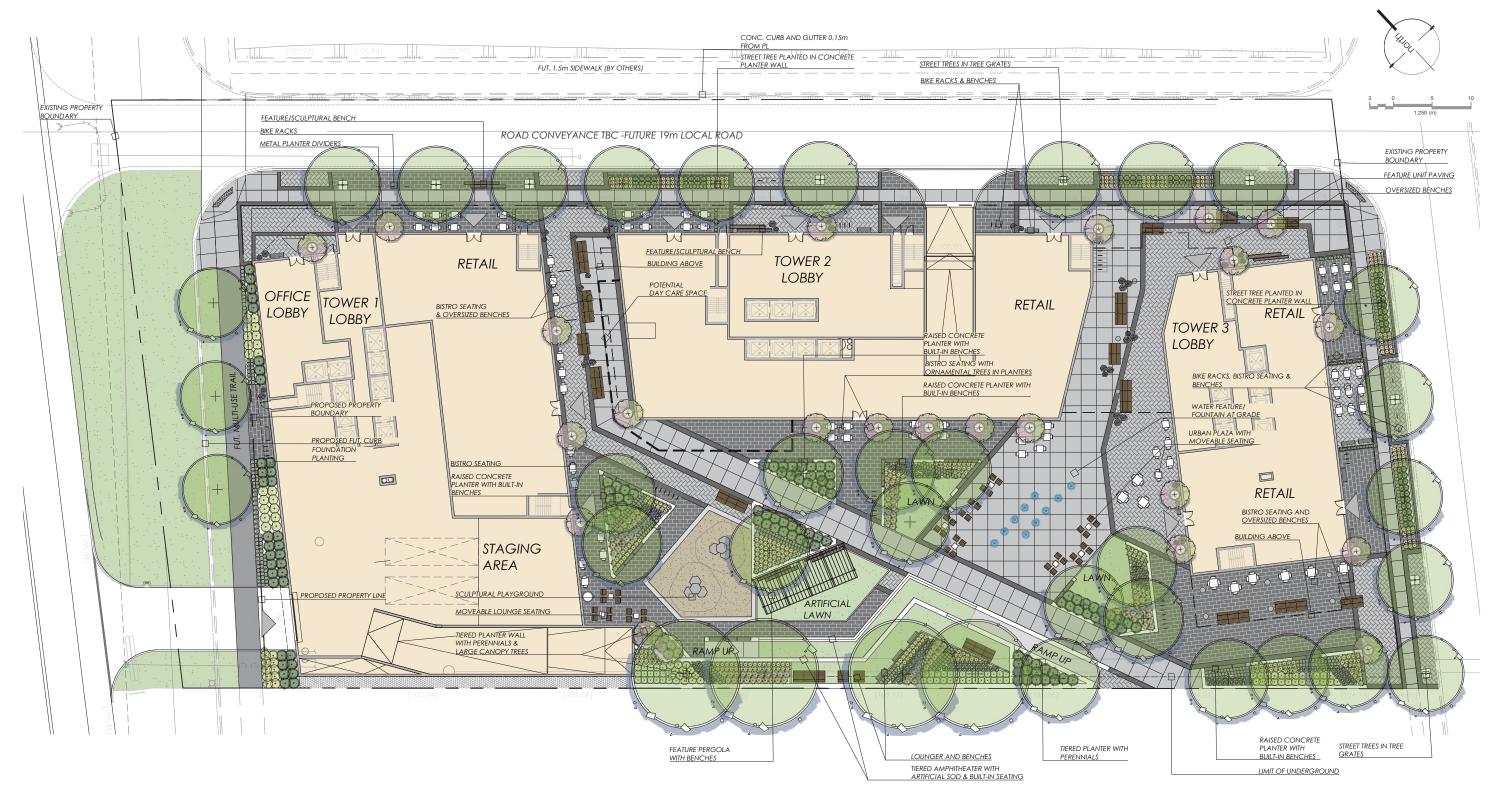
landscape Plan - Prepared by: (Adesso Design Inc.)
